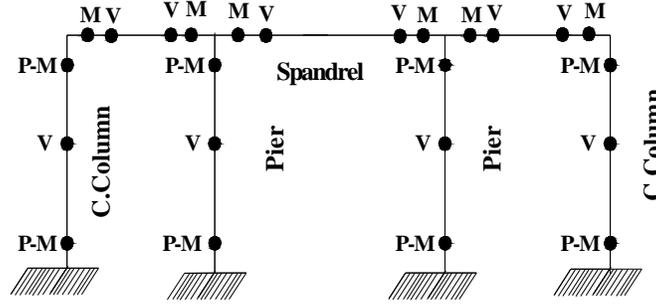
Locations of plastic hinges in piers, confining columns and spandrels
